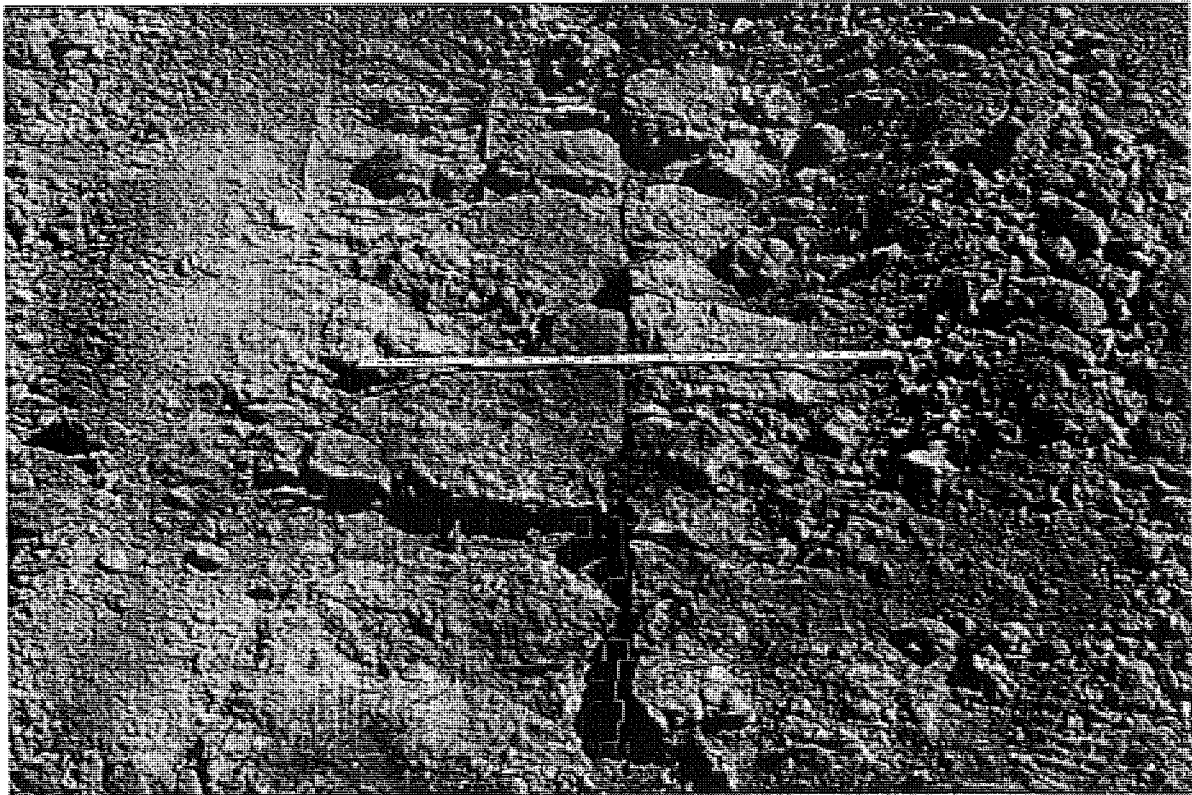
US-23 SB (Alpena) trench in rubblized concrete at a transverse joint
